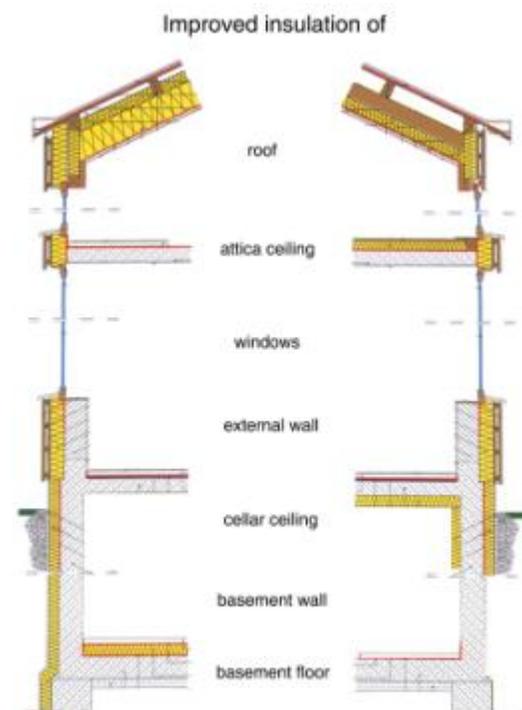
Example of building insulation in Berlin. Two different applications of insulation material (marked in yellow) in the roof are: (left) all insulation in the roof (heated attic); (right) one insulation layer above the attic ceiling, another insulation layer in the below the rafters (attic as a buffer zone). The basement insulation on left includes radiant floor heating whereas on the right the insulation layer is under the basement ceiling (unheated basement).
